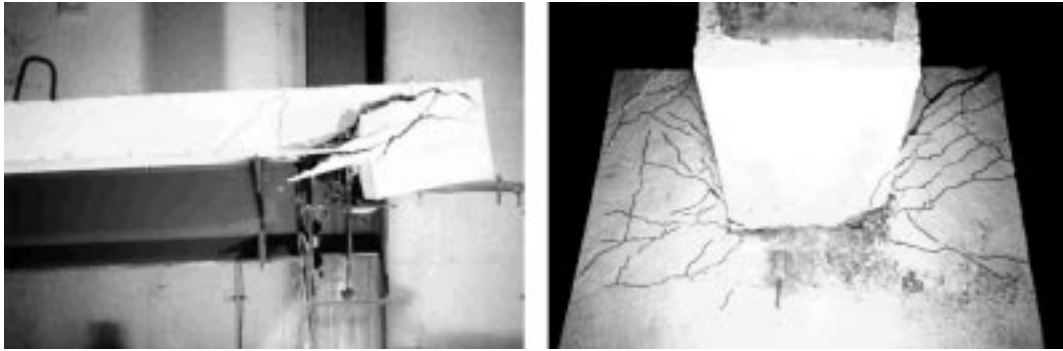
Photos of the prototypes after testing (a) Test E9 Steel column, (b) Test E10 Composite column
